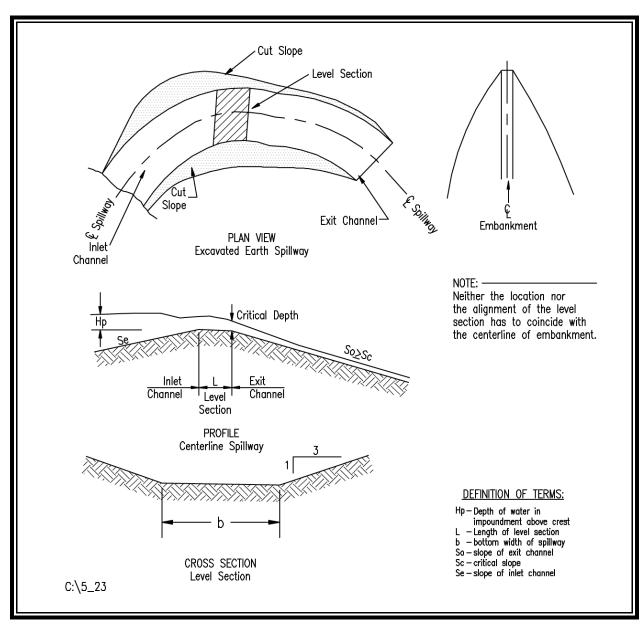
23 Vegetated Emergency Spillways: Typical Plan and Section
